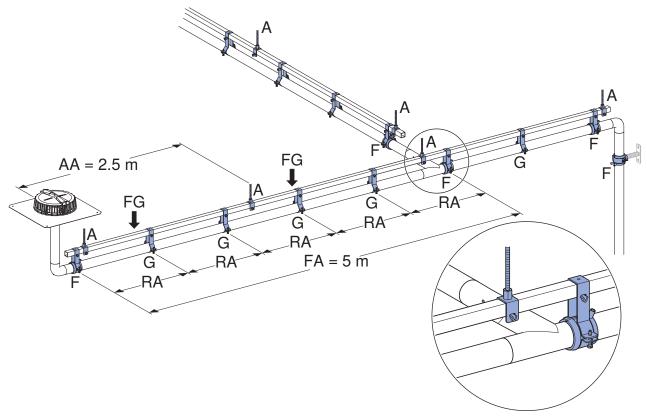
Fastening distances for the Geberit Pluvia fastening system without support shells
